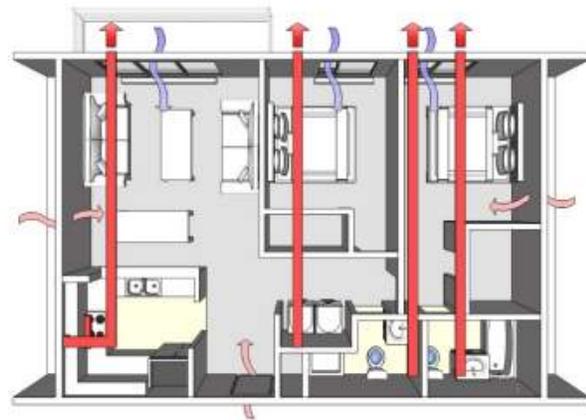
A basic exhaust-only ventilation system that consists of bathroom exhaust fans and a kitchen range hood exhaust fan.
